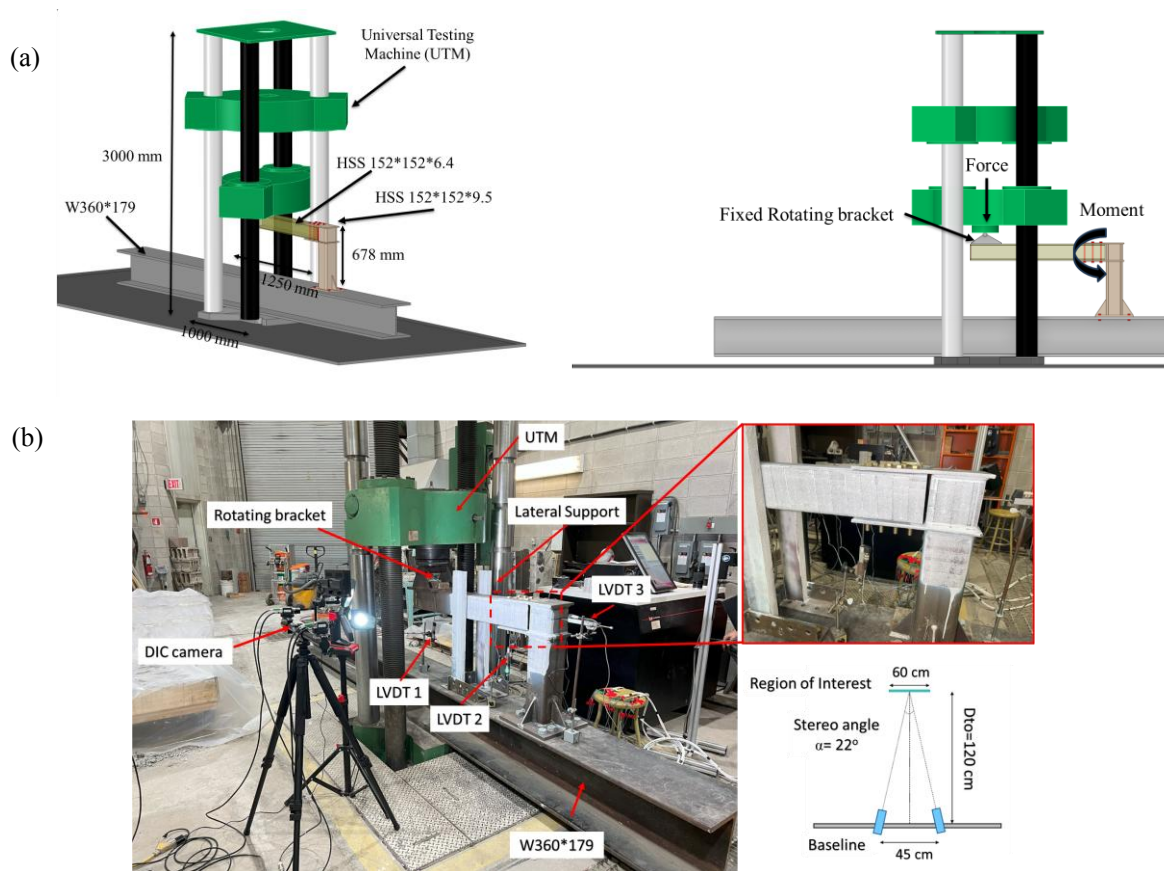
Arrangement of the test device (a) 3D schematic view of the test setup; (b) photo of the loading machine, DIC camera stereoscopic setup and speckles pattern
